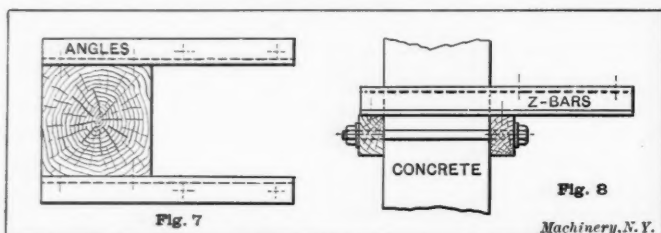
Angle Support for Attaching to Wooden or Structural Steel Column. Fig. 8. Z-bar Support for Concrete Columns where Bolts are not incorporated in Original Column
